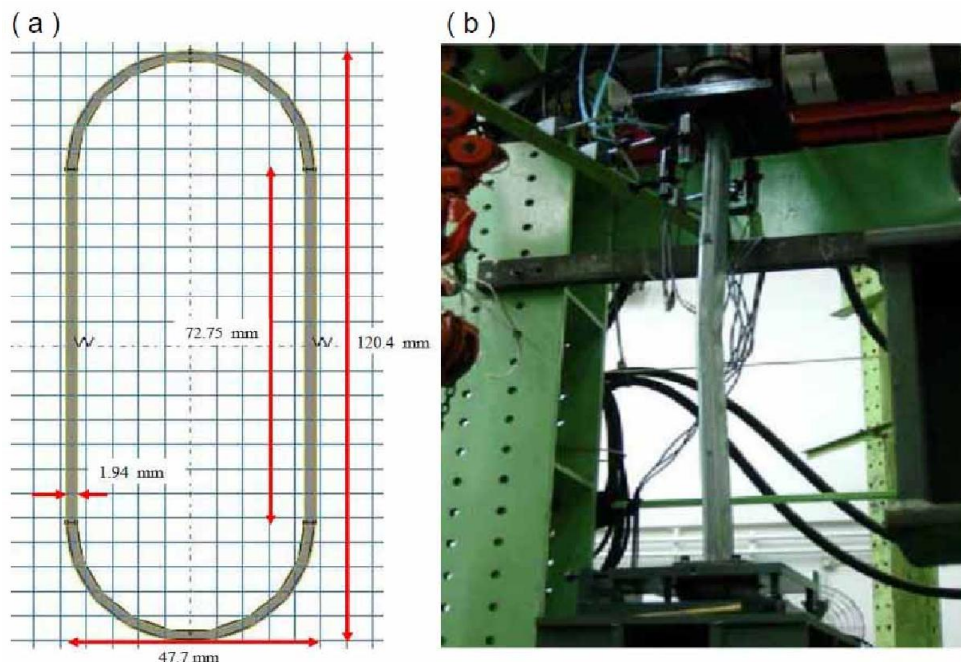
(a) Dimensions of the cross section of the EHST column (b) Fixed ended column test (Source: Zhu, J. and Young, B.)
